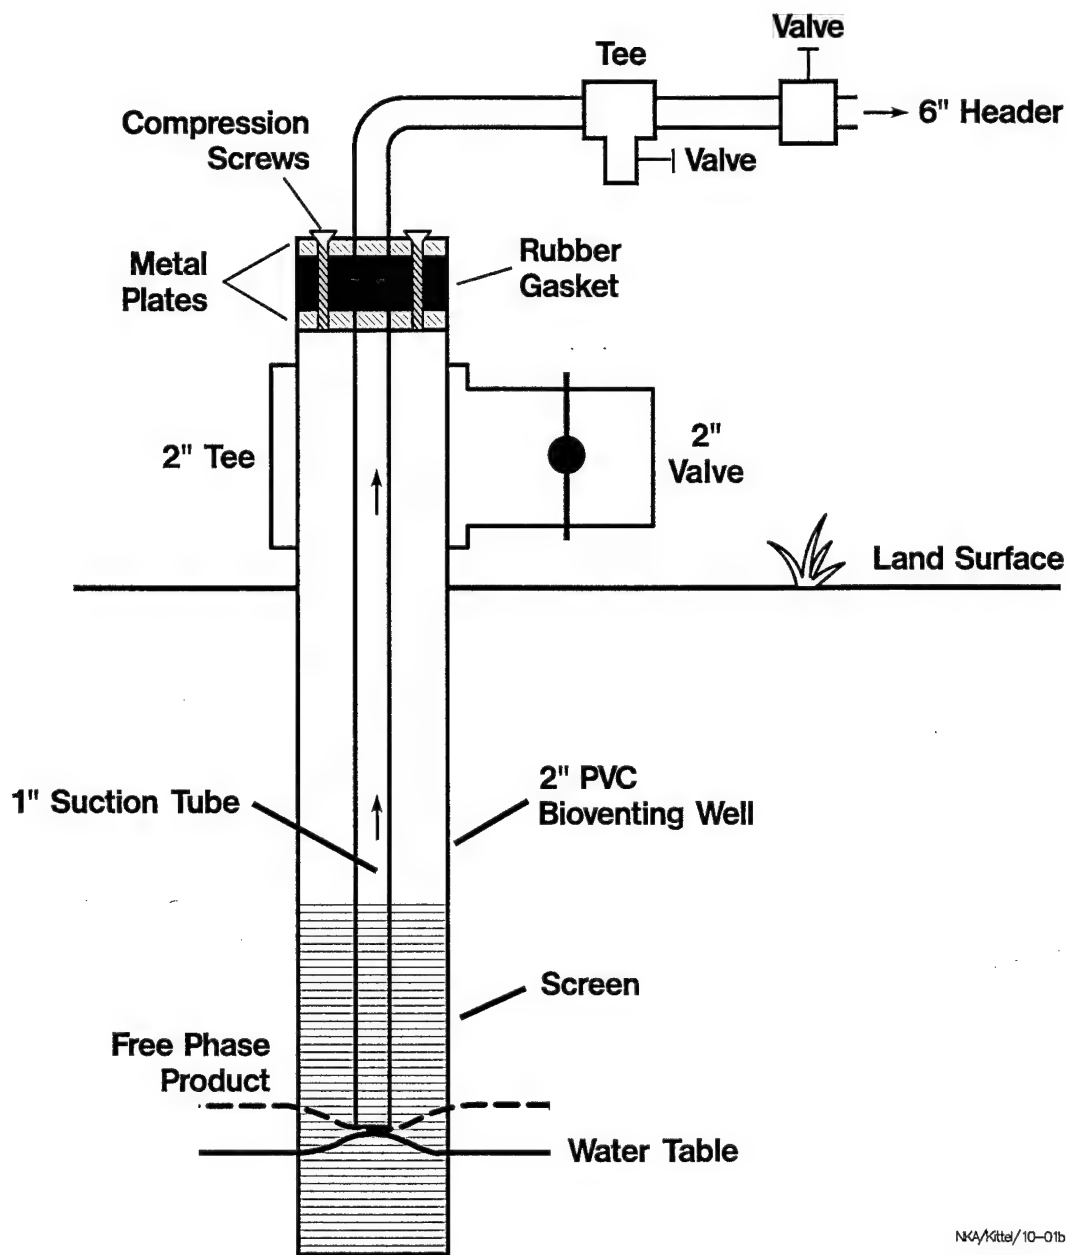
Slurper Tube Placement and Valve Position for the Bioslurper Pump Test
